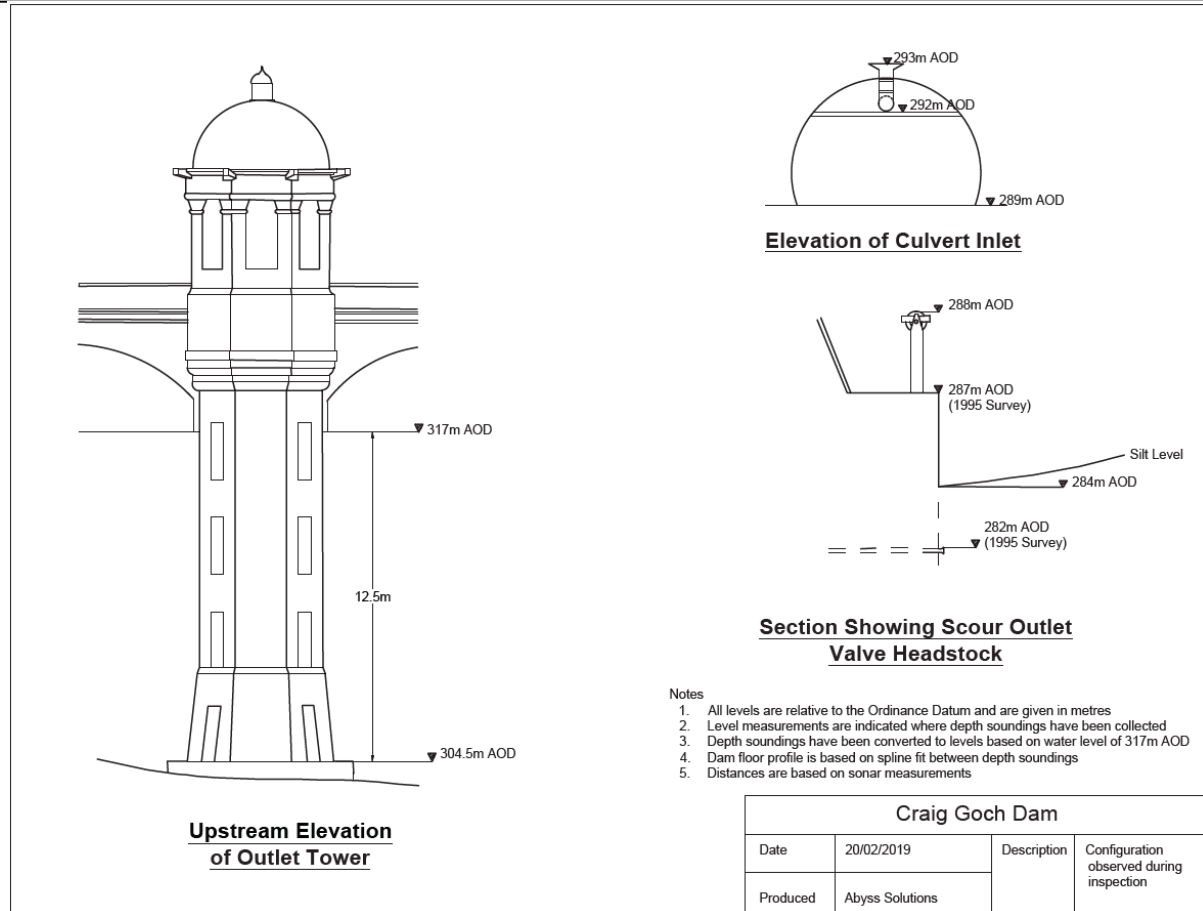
2D plan of dam showing details of tower, scour outlet and culvert inlet.
